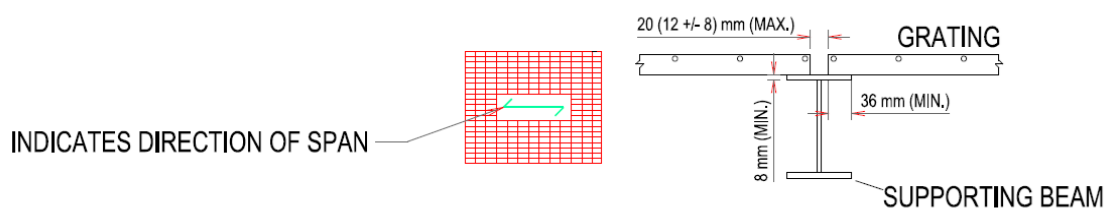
A – Direction of Span and Supporting Beams details
